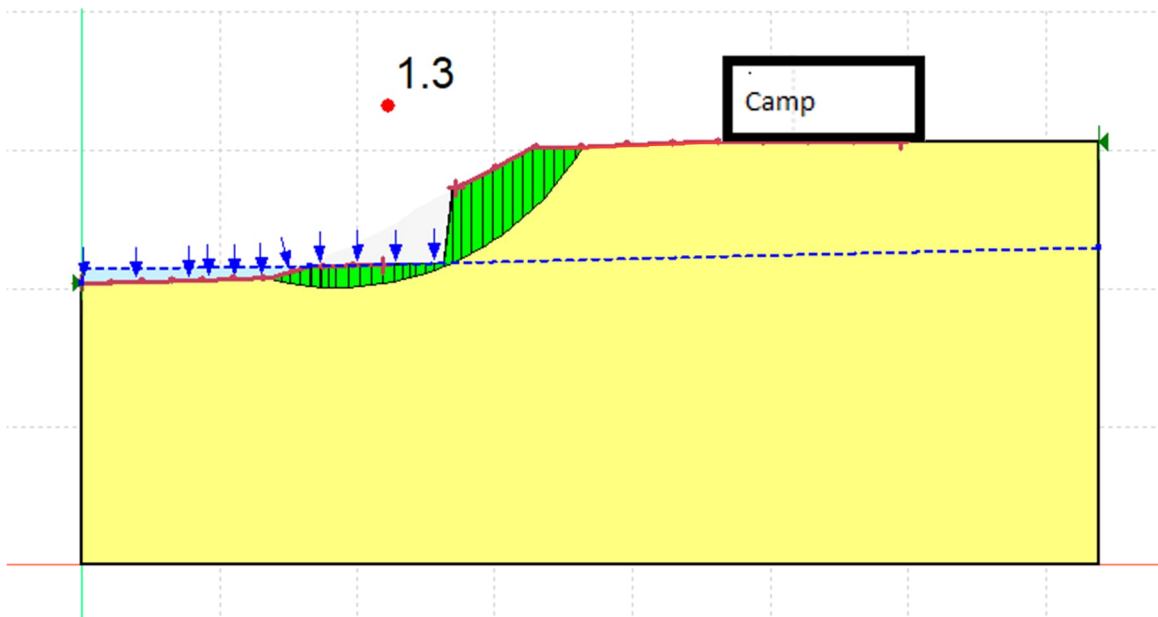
Section 1 through the lower slope leading to the lake shore, with 5 m of erosion.
